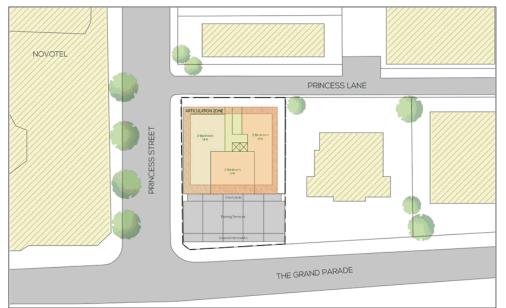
Indicative Plan Layout (Architecture & Building Works 2015)
